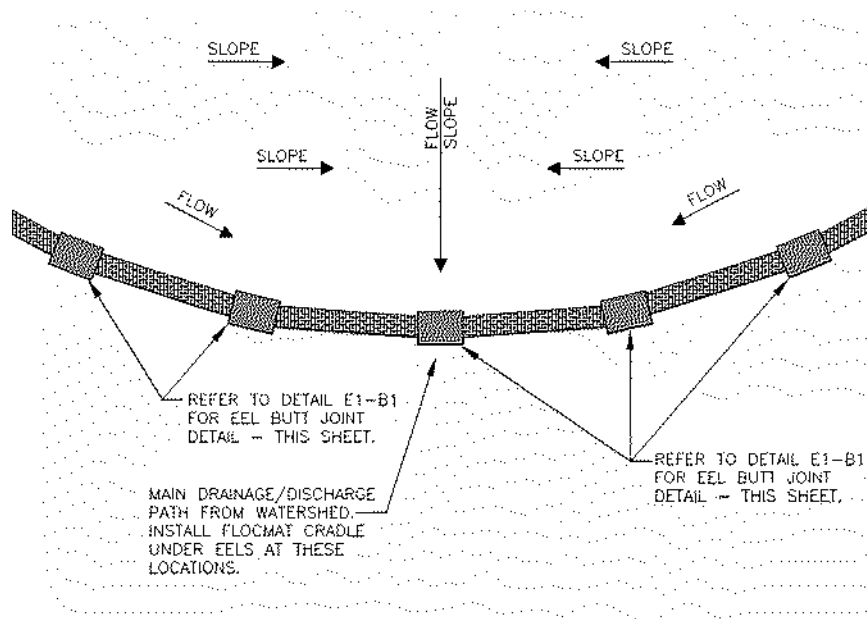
C: INTERCEPTING SHEET FLOW
